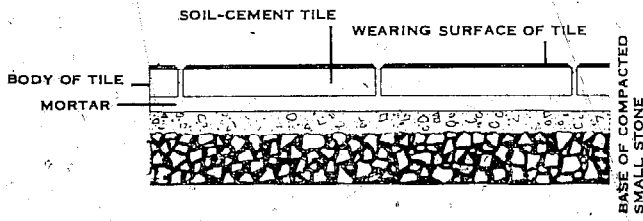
Cross-section of a floor made with soil-cement tiles.
